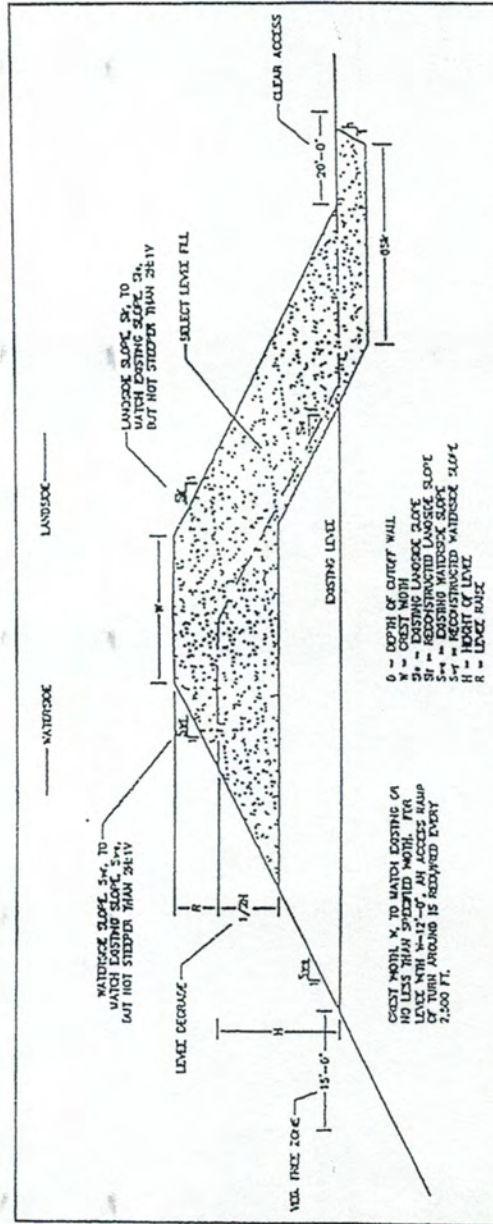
Levee Reshaping and Levee Raise Typical Plan.
